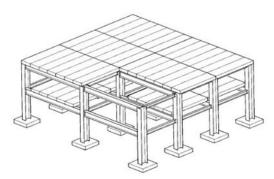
typical multi-story frame structure in which a skeleton of steel beams and columns supports a floor of reinforced concrete slabs. Walls are non-structural and can be positioned to suit space-planning requirements. (Macdonald, Structure and Architecture, 1994, p. 51)
